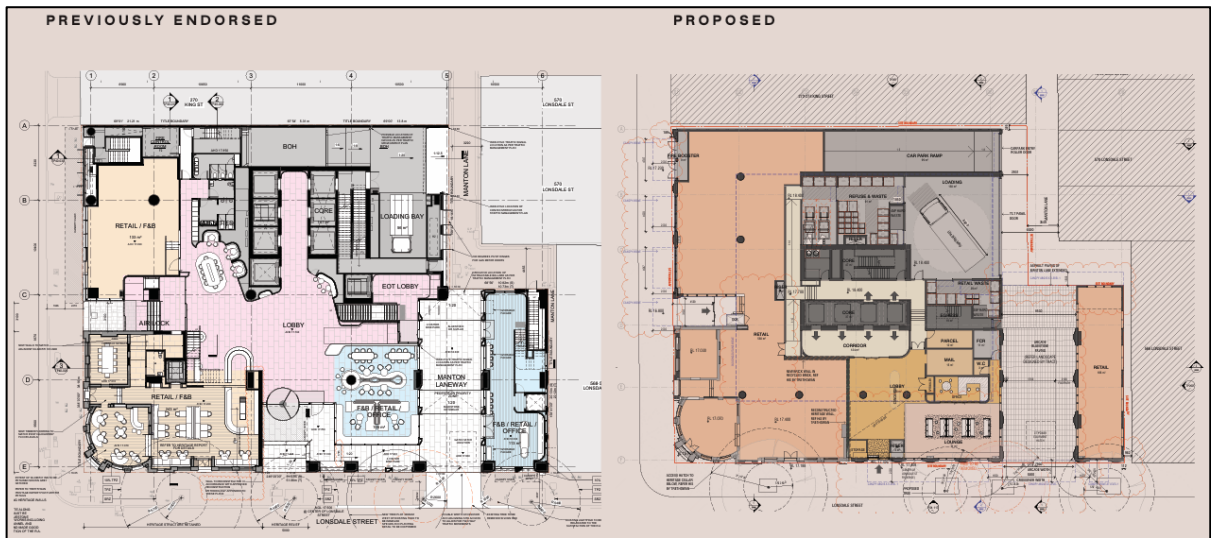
Approved (left) and proposed (right) ground floor plan (Source: Application)
